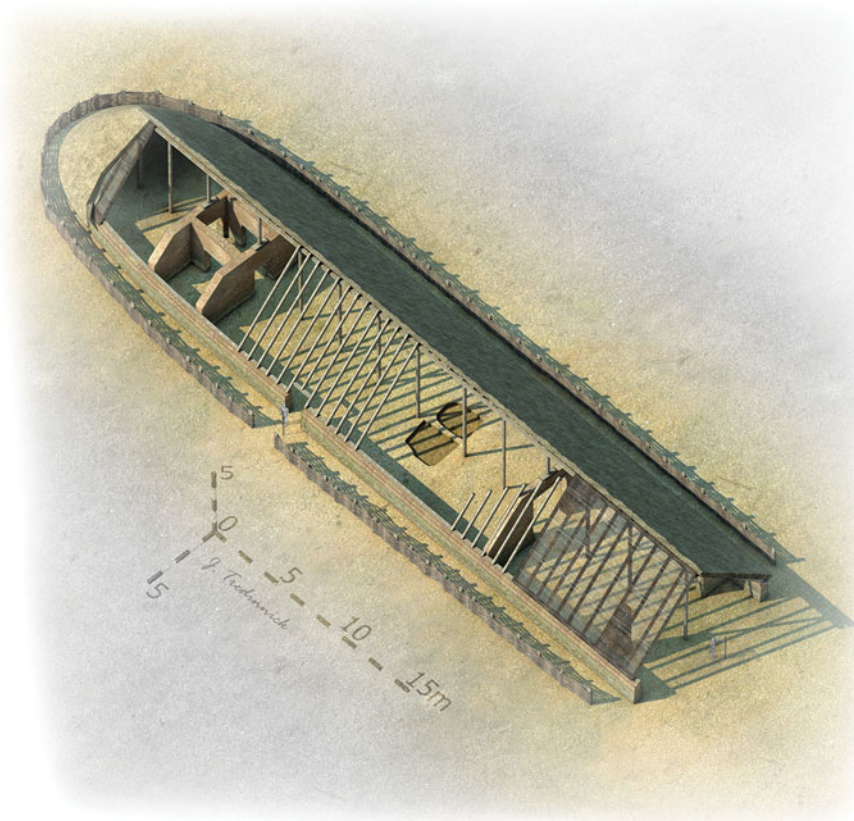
Alternative reconstruction of the Toumba building showing a fence instead of a 'veranda'.
